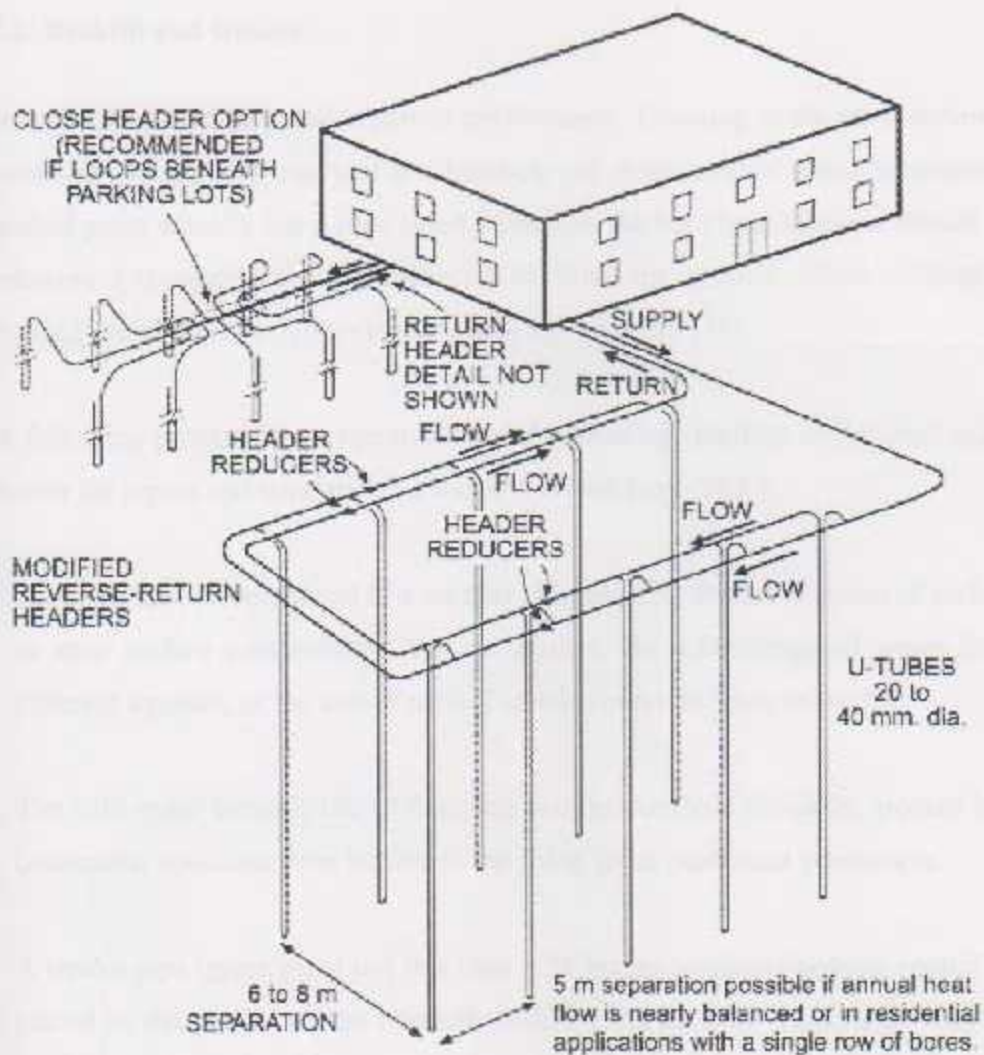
Vertical Ground-Coupled Heat Pump Piping
